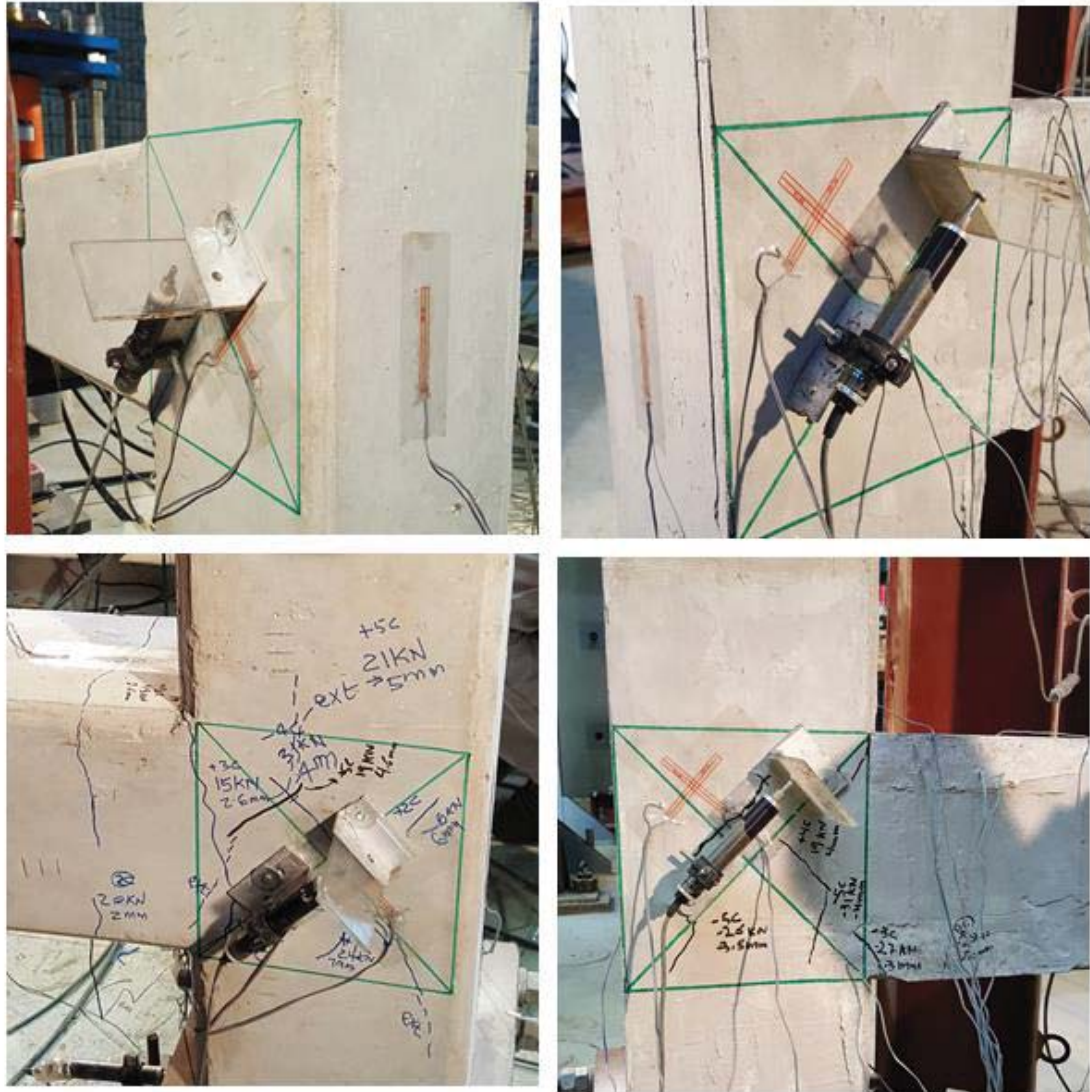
Development of cracks in initial loading stage of specimen SP-4
